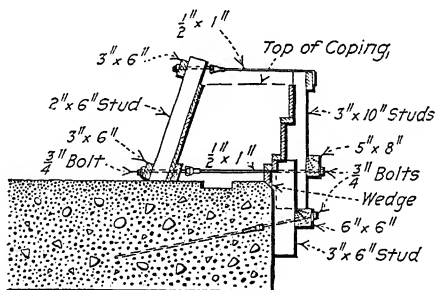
Spandrel wall forms used in constructing the Yardley bridge, Philadelphia & Reading Ry. Co.
